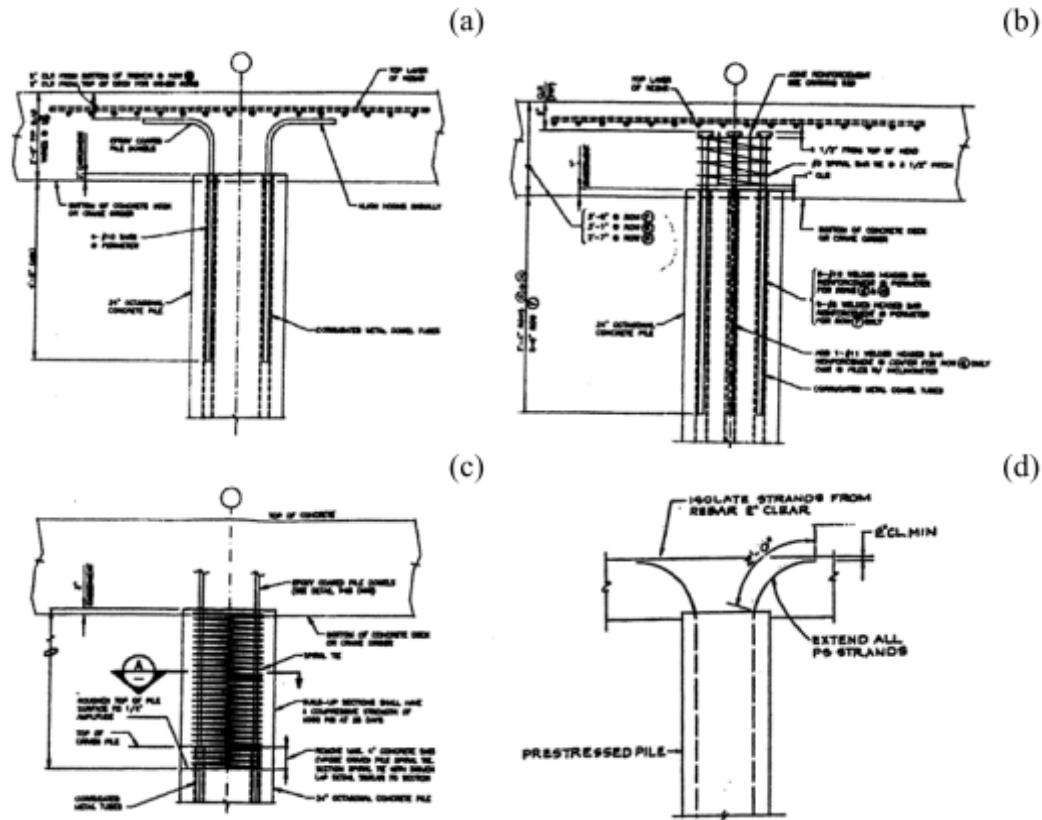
Typical configurations of common pile-deck connections: (a) embedded dowel with outward bent bars, (b) embedded dowel with T-headed bars, (c) extended pile, and (d) extended strand.
